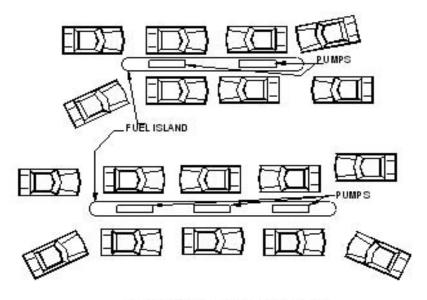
Sample Acceptable Parking Sizes and Layouts
